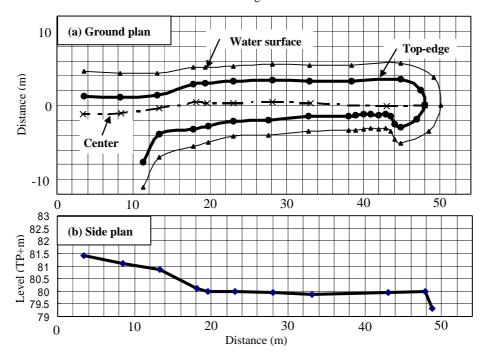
Ground plan and side plan of old groin called as "Kami-Naizen".
